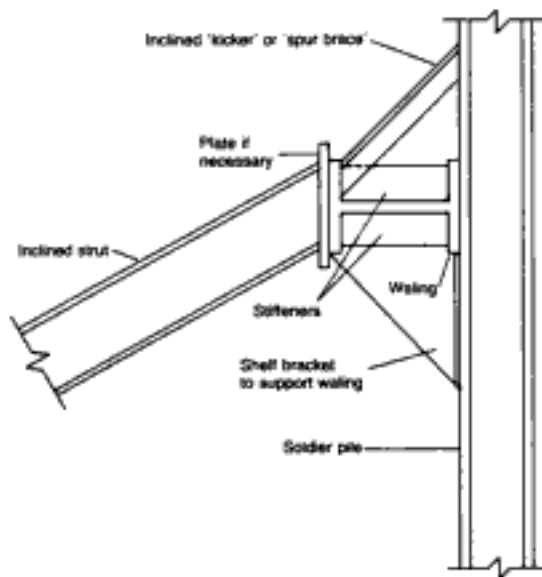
Typical steelwork detail at junction of rakes and waling with bracing to prevent rotation of waling
